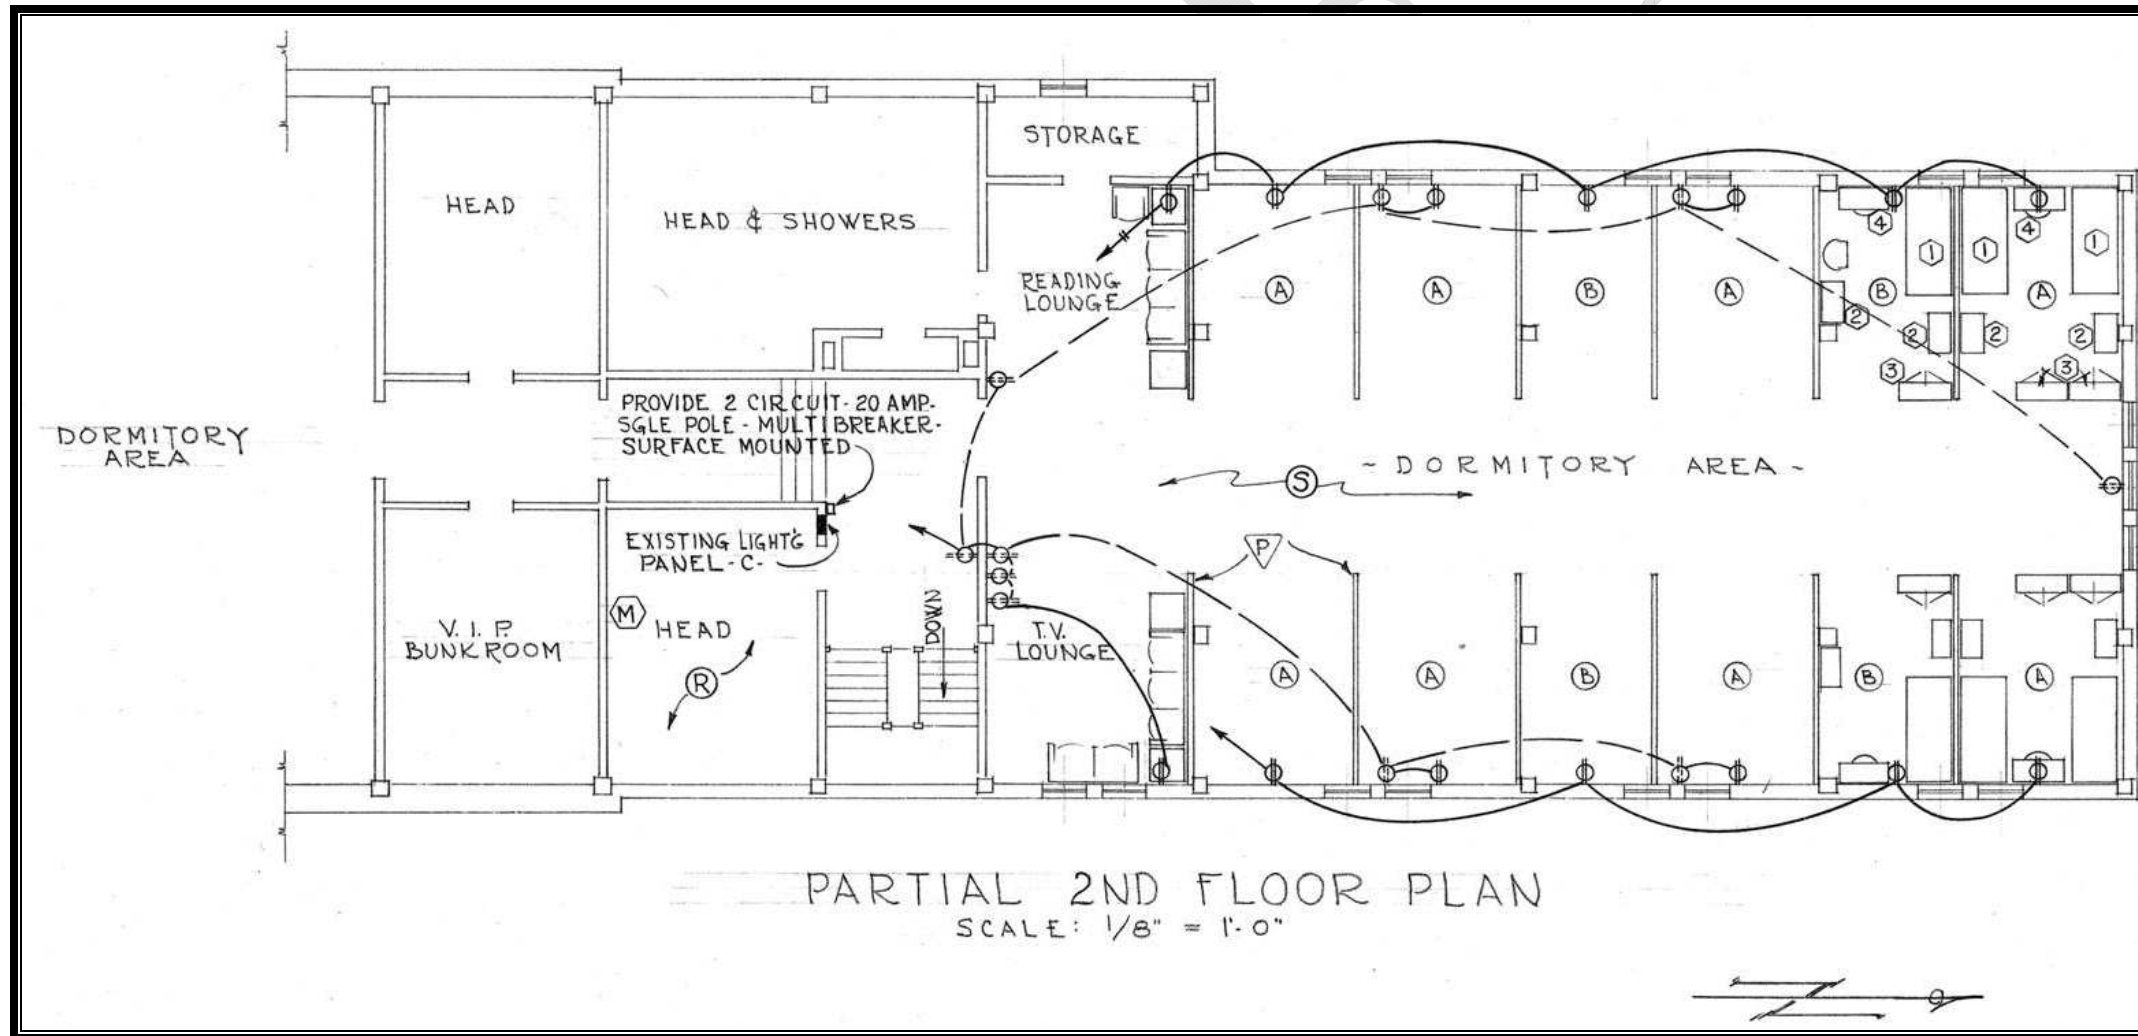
Building G, 1960 renovations (Courtesy Naval Air Station North Island)
